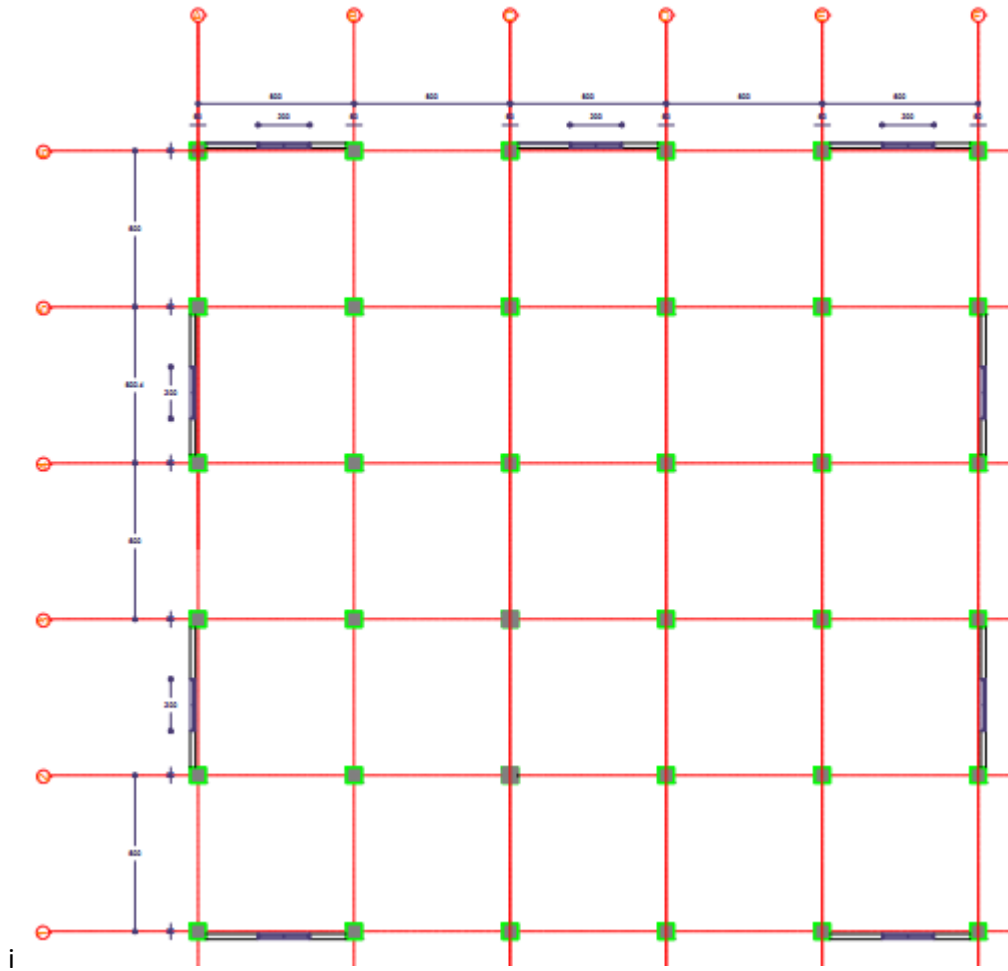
Typical floor plan of with 75% of wall removed from base-infilled frame
